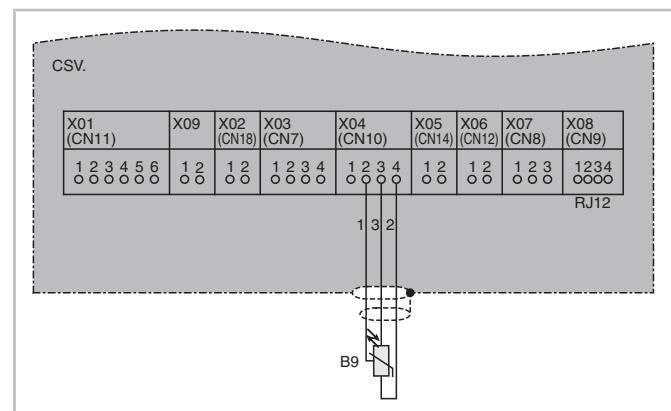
Electrical connection of the optional pressure transmitter B9 to terminal strip X04 (CN10) which is part of the control board located in the lower part of the FI housing
